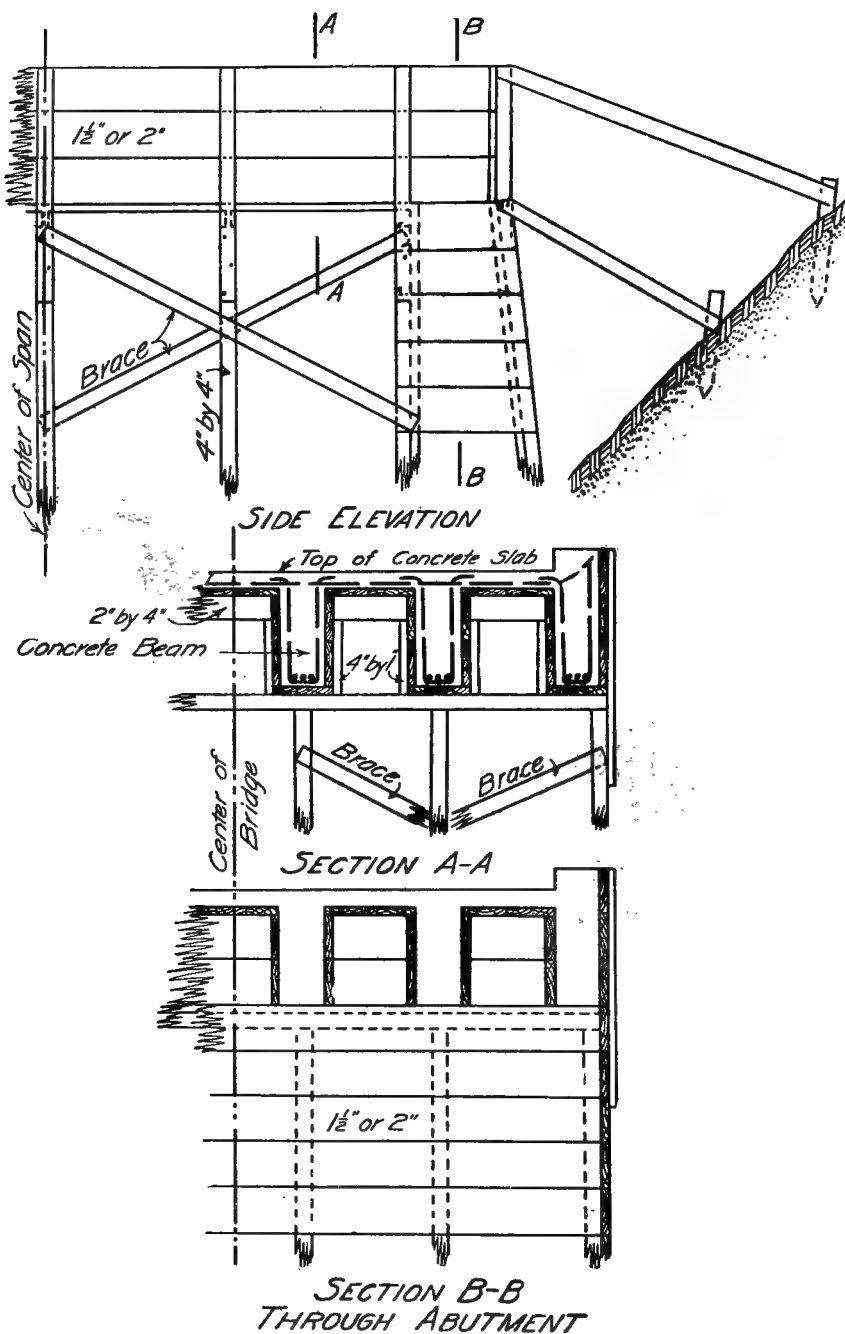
FORMS FOR DECK OF COMBINED BEAM AND SLAB BRIDGE.
